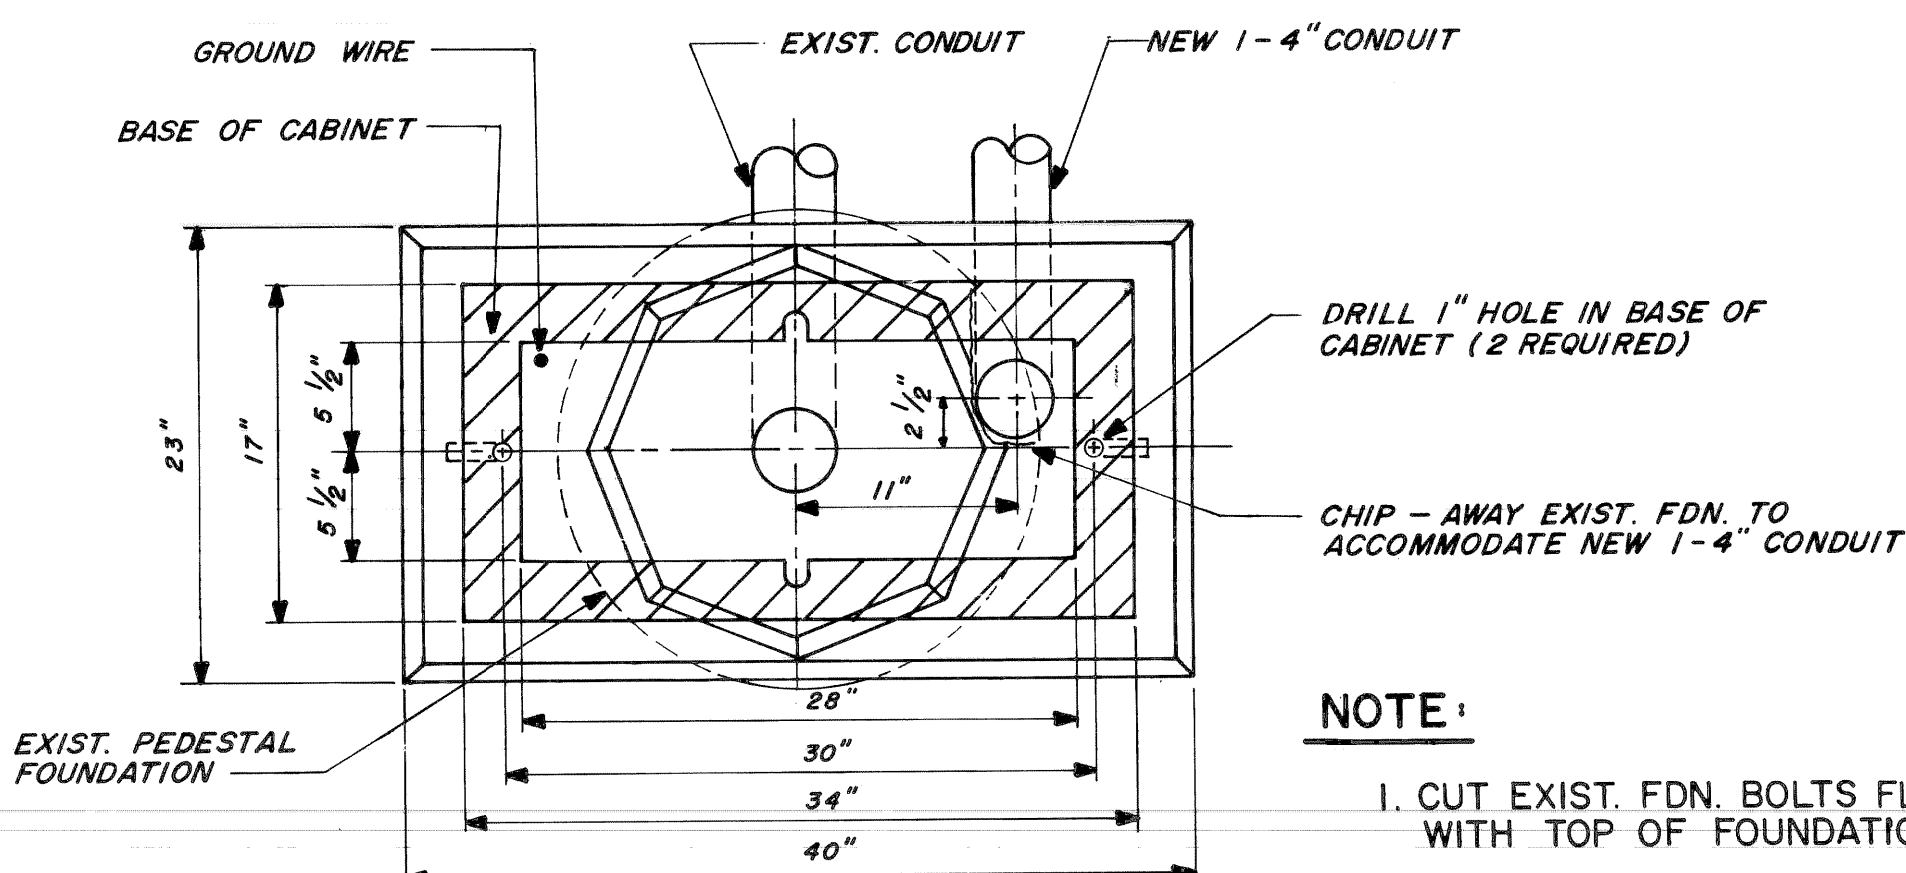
DETAIL OF INSTALLING CONDUIT INTO EXISTING FDN.
